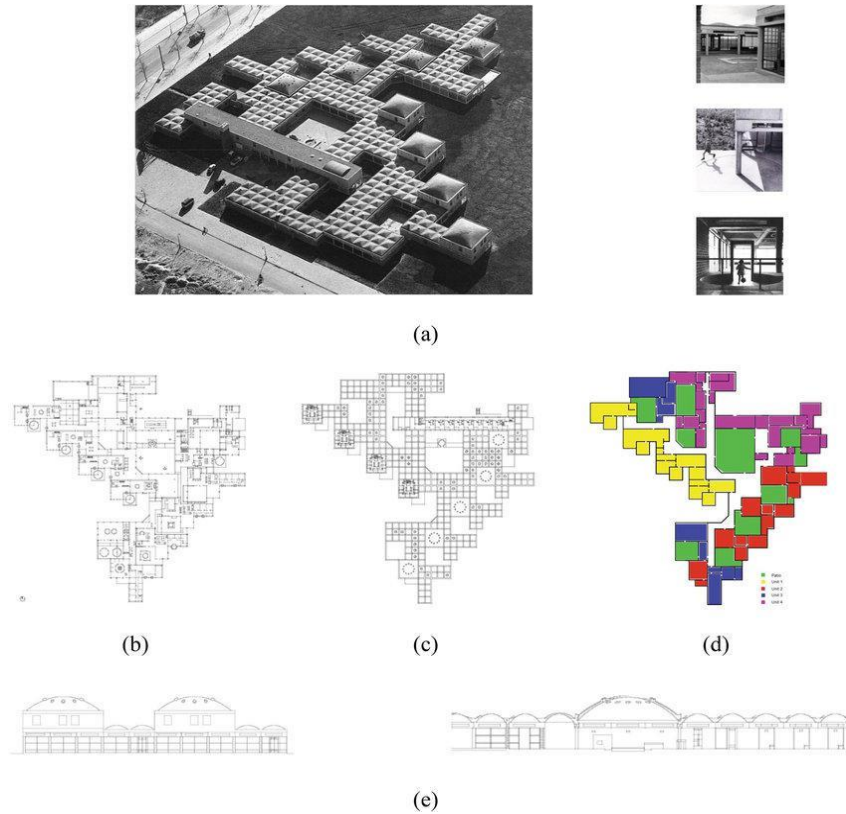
(a) Amsterdam Municipal Orphanage. Arch. Aldo van Eyck, (Source: ArchDaily.com 2008-2014); (b) Ground floor plan; (c) First floor plan; (d) Functional scheme of the units in the original building; (e) Elevations (Source of images a, b, c and e, Weston)
